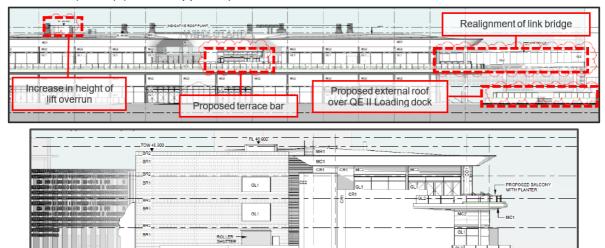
| Comparison of west elevation: approved plan (above) and proposed modification (below) (source: Applicant)
